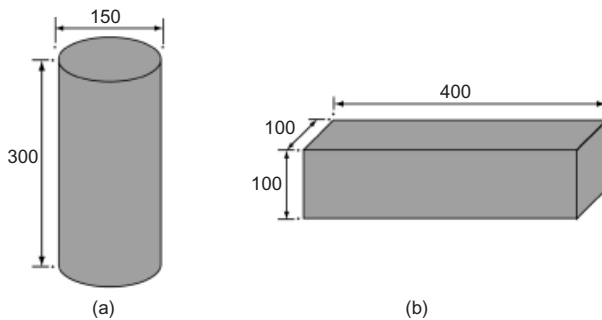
Dimensions of control specimens: (a) specimen for drying creep; (b) specimen for drying shrinkage. Units: mm
